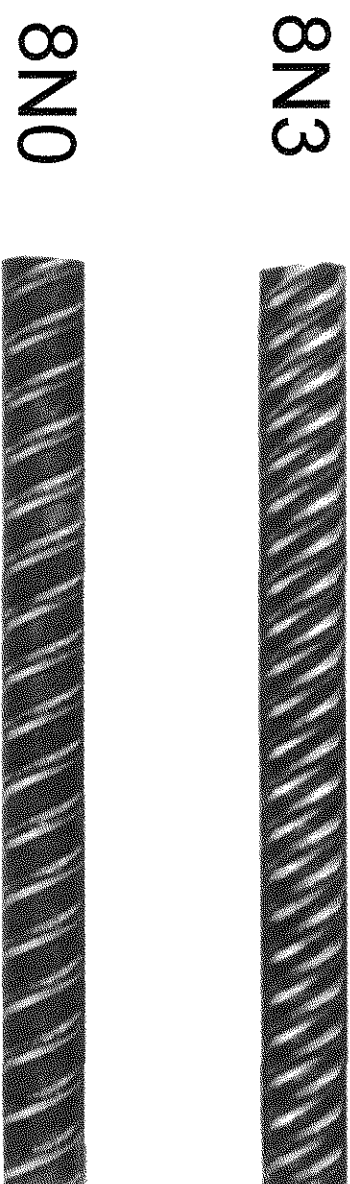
Reinforcing bar deformation patterns, No. 8 (25 mm) bars
